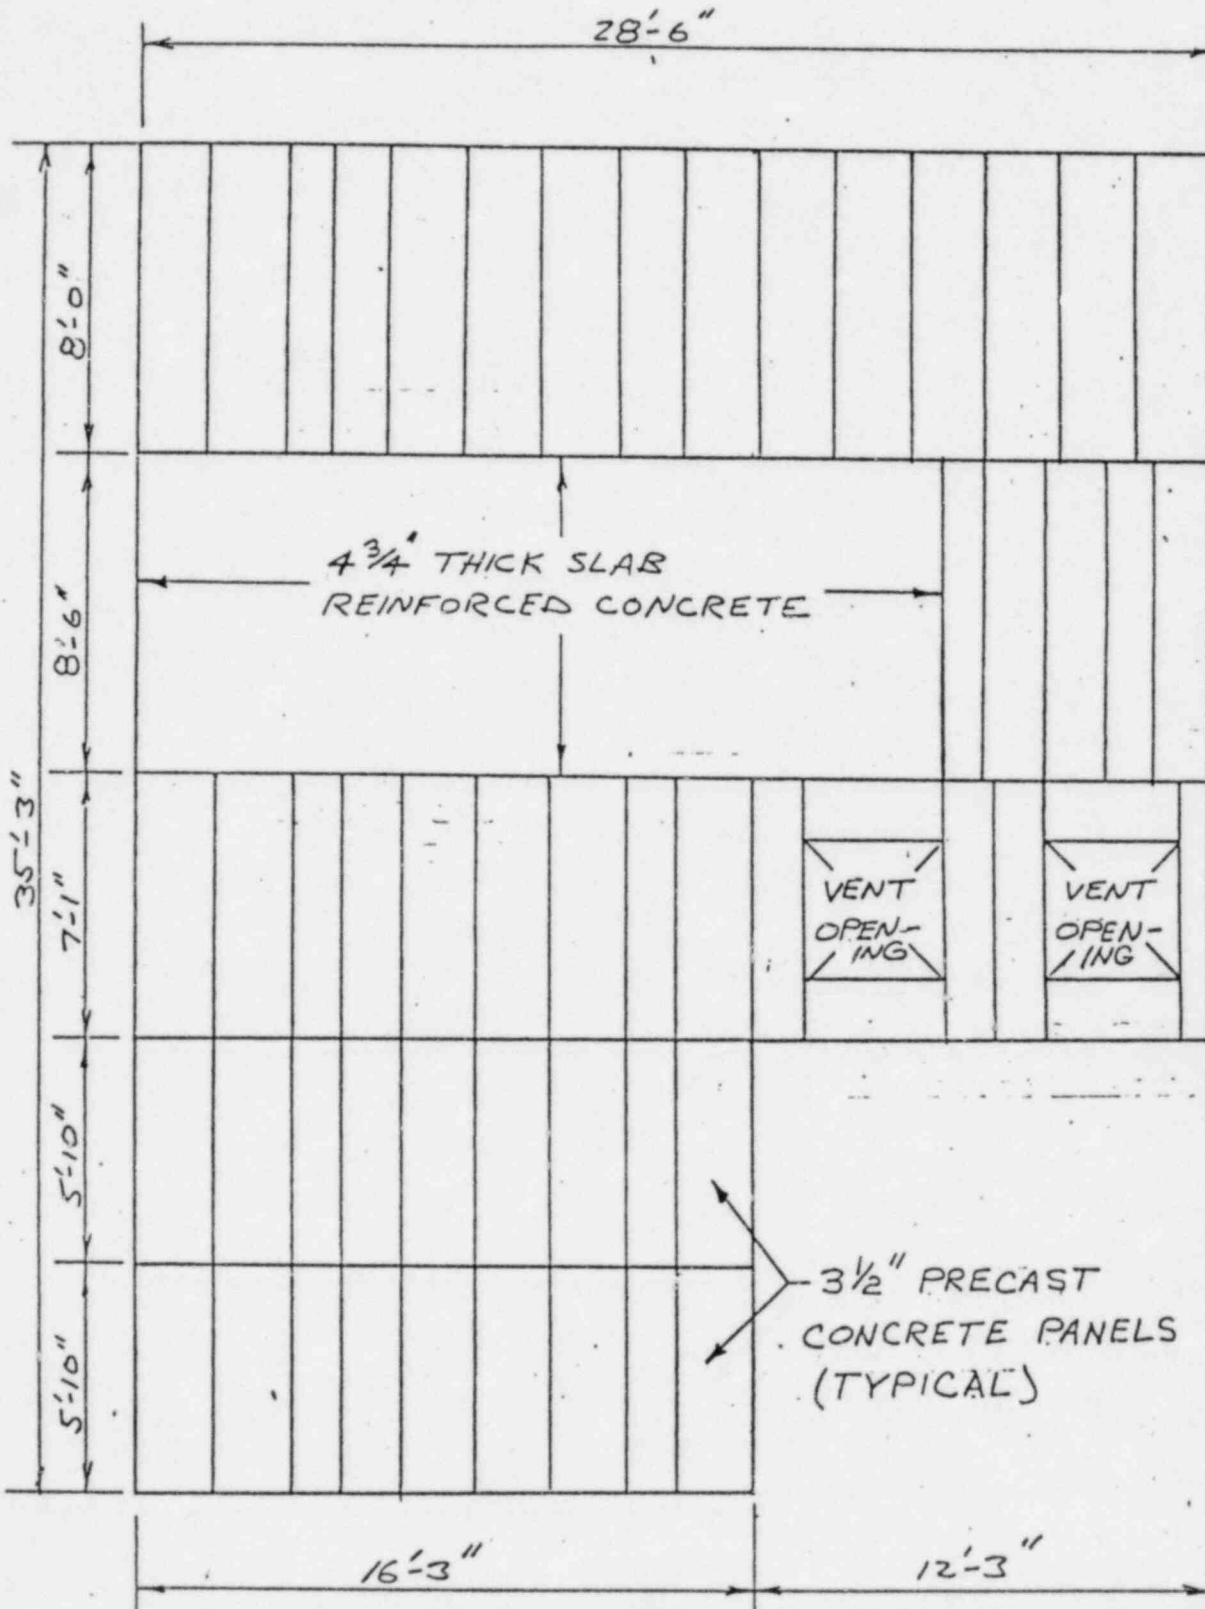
PRECAST CONCRETE ROOF PANEL ARRANGEMENT
